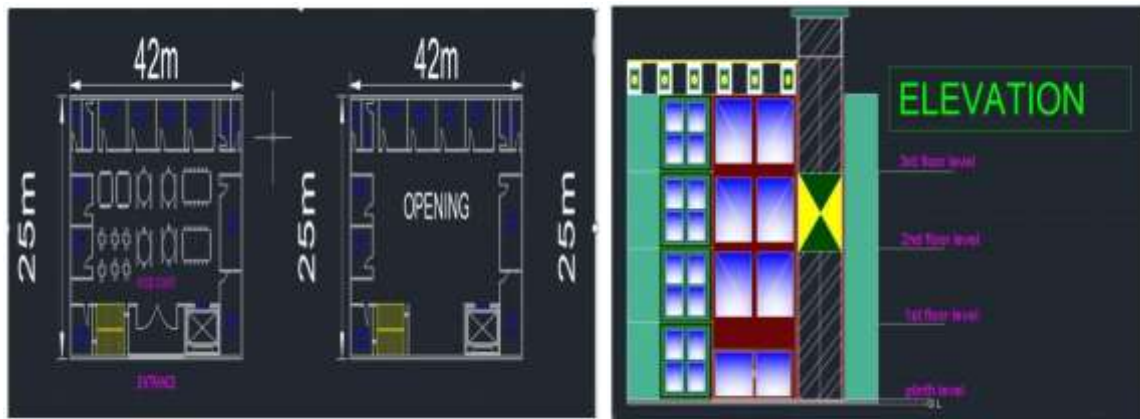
Plan View For Gf ,1ST, 2nd,3rd, 4th And 5th Floor FIG 4.4: Elevation View
